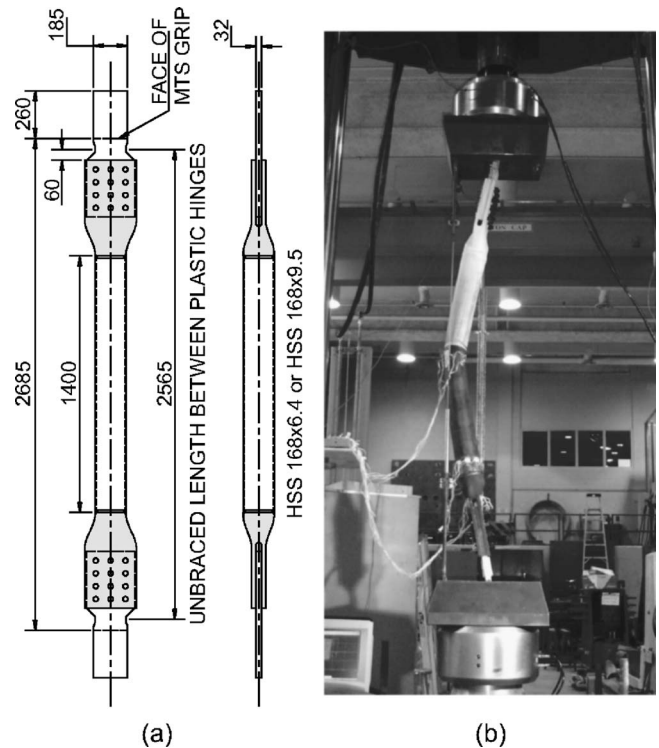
(a) Specimen details for cyclic testing; (b) specimen during compression loading cycle
